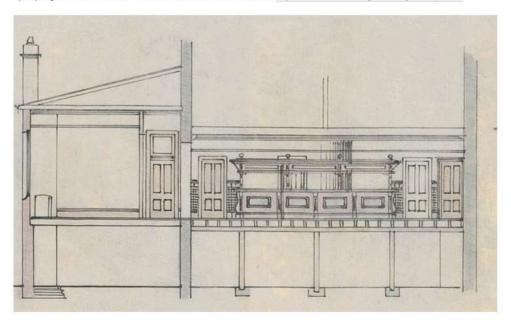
Detail of the 1911 plans showing the proposed new bar arrangements. The extant ground floor level ceiling reflects the corresponding bar arrangements in this space.
